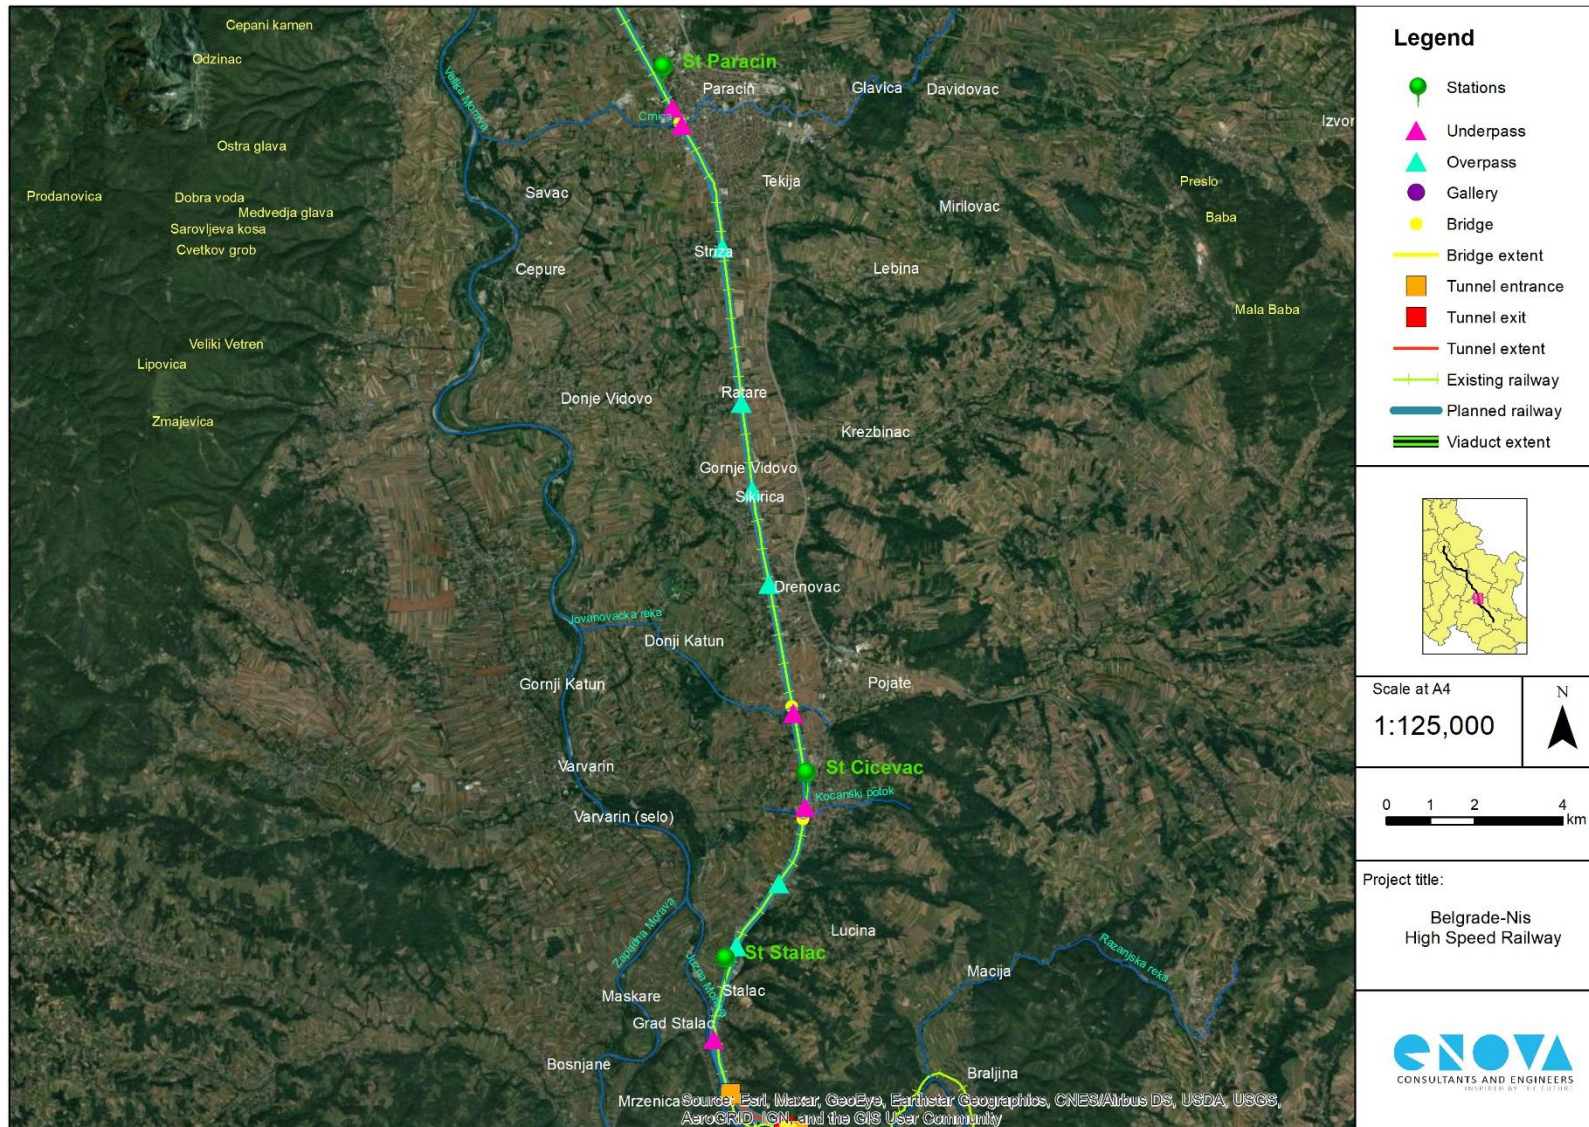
Existing and planned railway with ancillary structures (Paracin-Stalac subsection)
